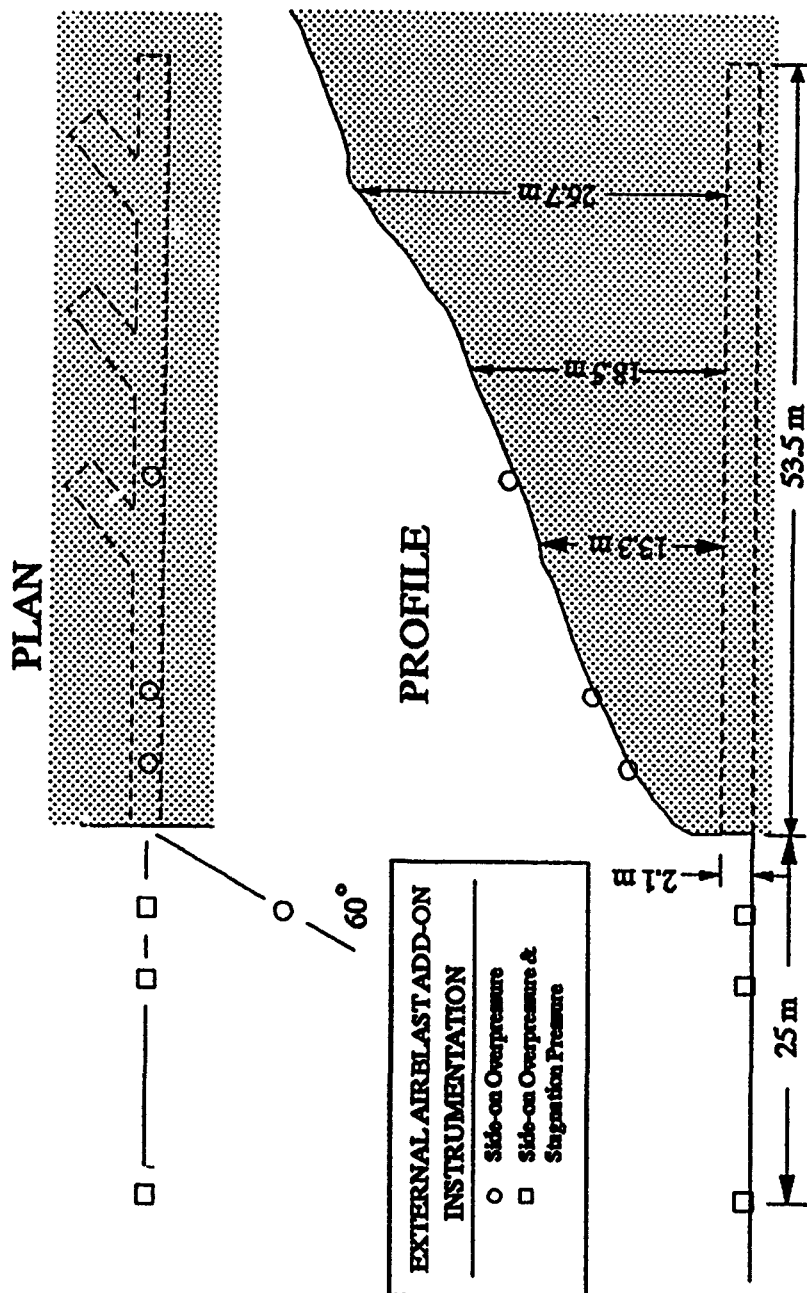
External airblast gage locations, 1/3-Scale Camp Stanley Underground Munitions Storage Concept Validation Test.
